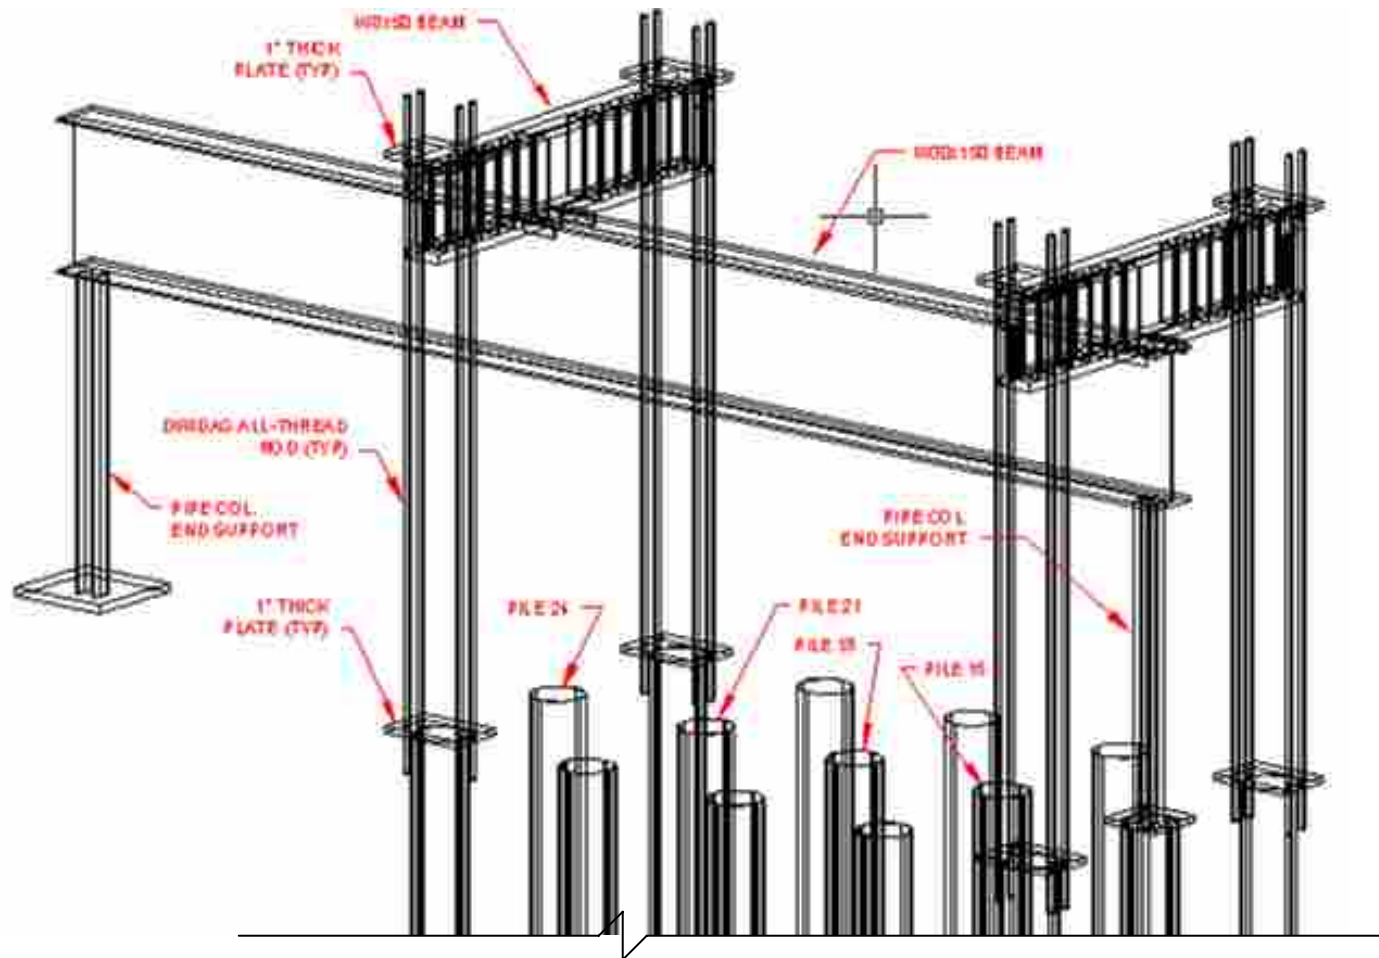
Static Load Test Frame (2002 Static Load Tests)
